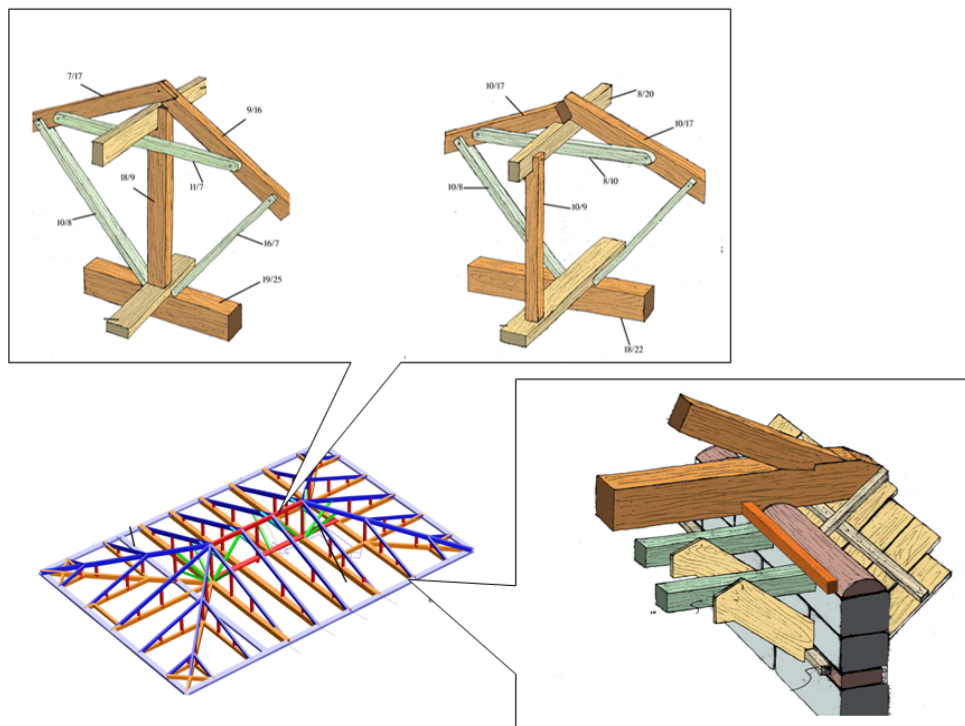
Examples of axonometric drawings of the structural system and construction details
